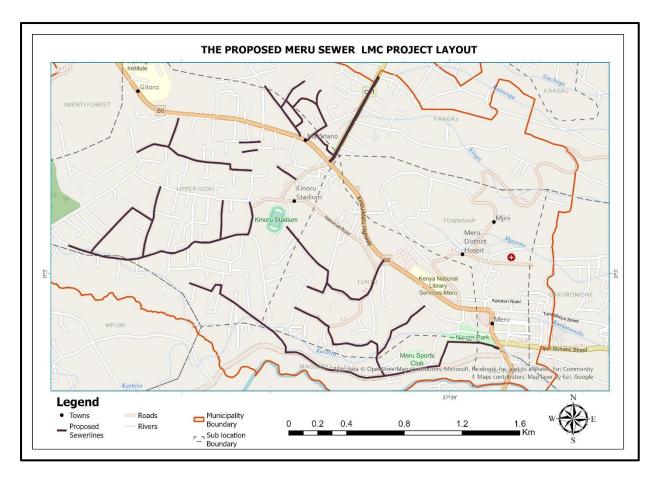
Proposed Meru Sewer LMC Layout Table 2-6: Sewage collection and conveyance system pipe sizes and lengths
